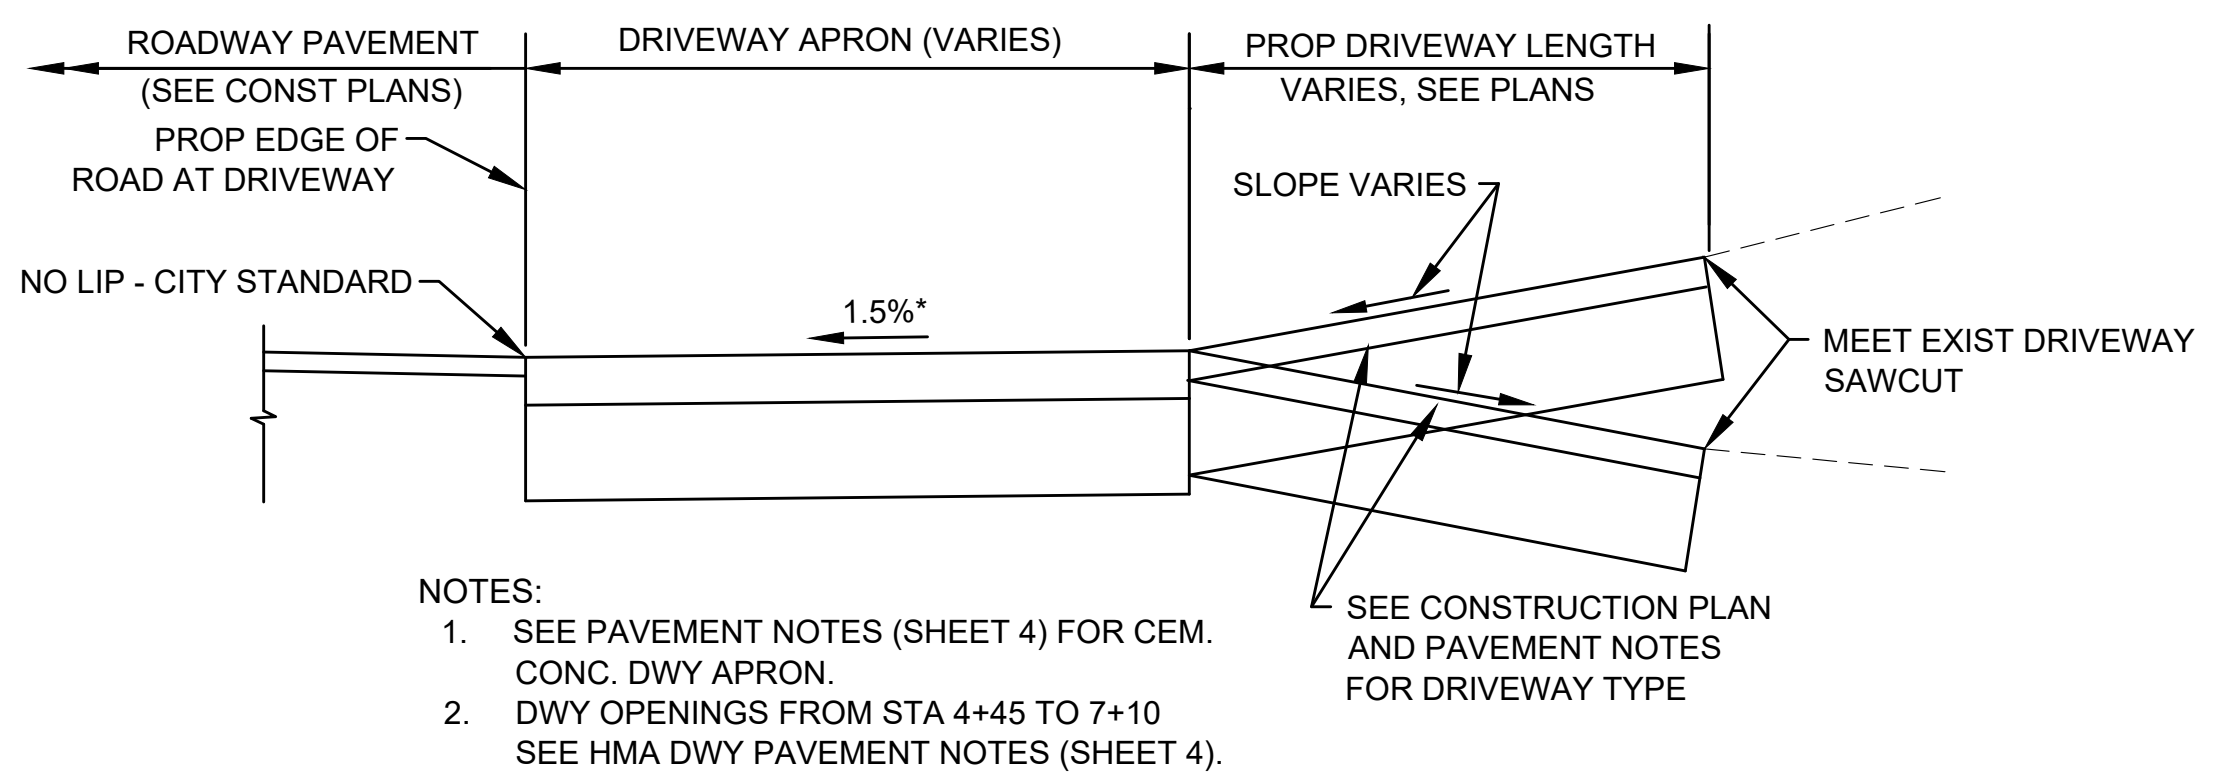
DETAIL FOR TYPICAL DRIVEWAY WITH SIDEWALK - TYPE A
